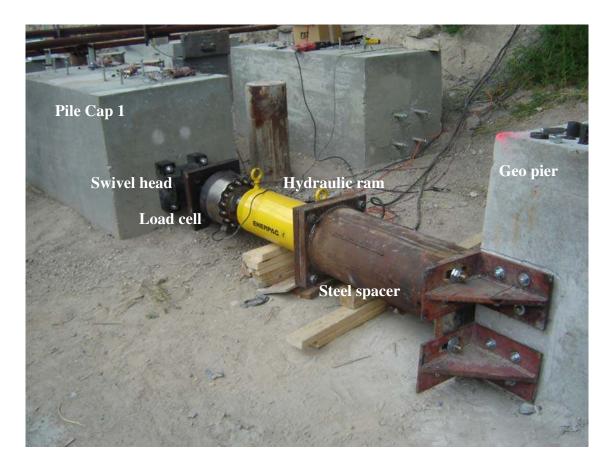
Photograph of test set-up for Pile Cap 1.
